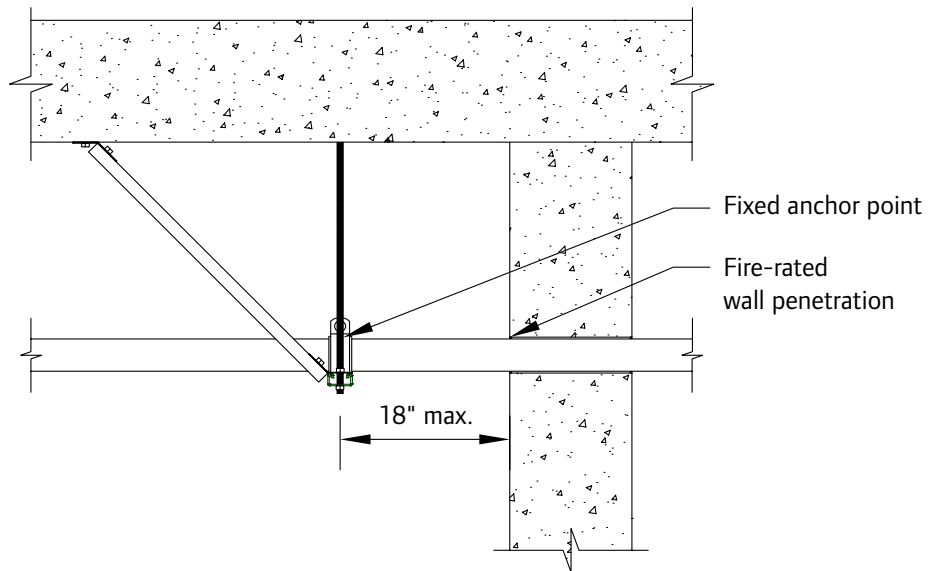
Fixed Anchor Point — Fire-rated Wall Penetration
